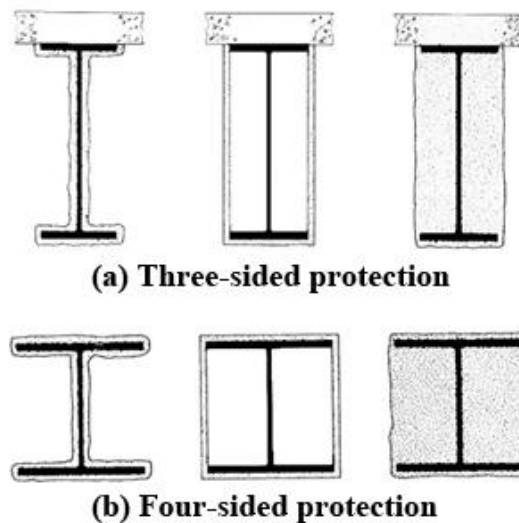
Sprayed, board and solid insulating concrete protection (ASFP 2010)
